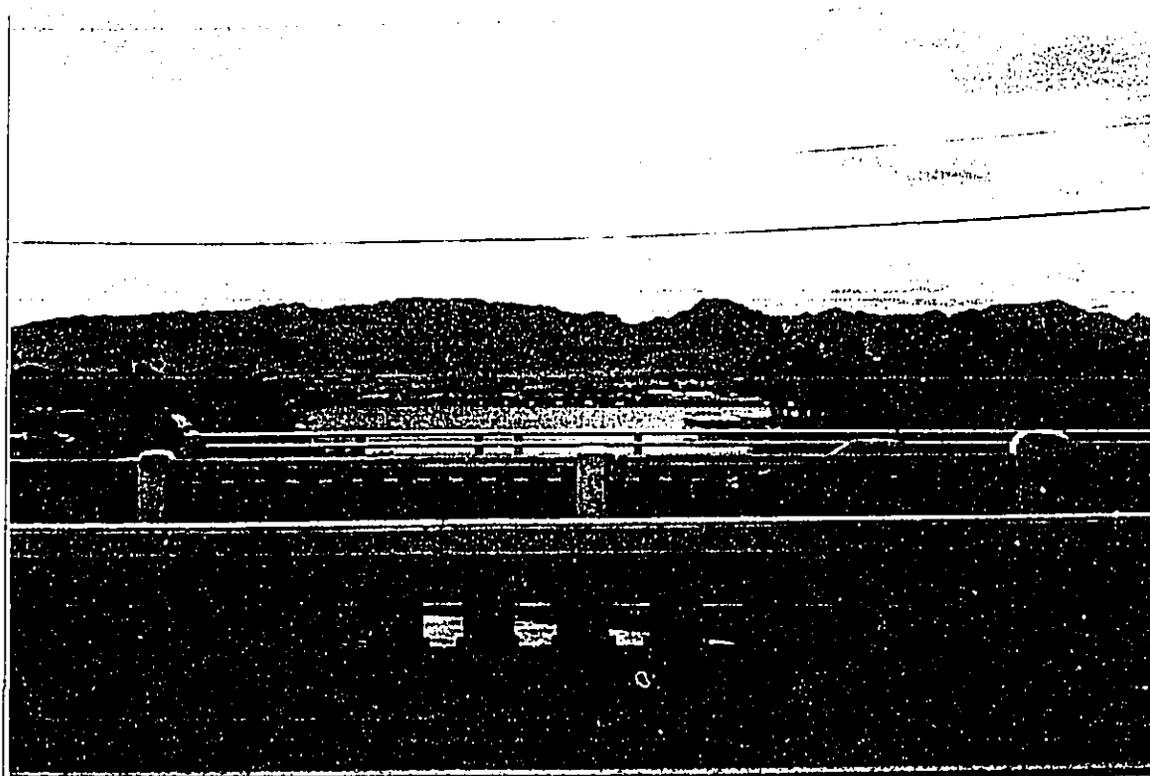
looking west from the outbound lane of the Halawa Bridge.
